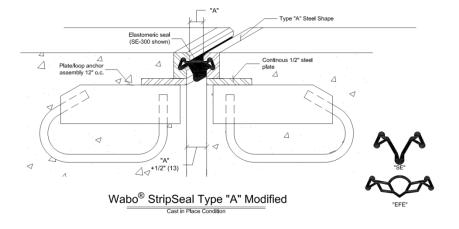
MassDOT Wabo StripSeal Type "A" joint detail
